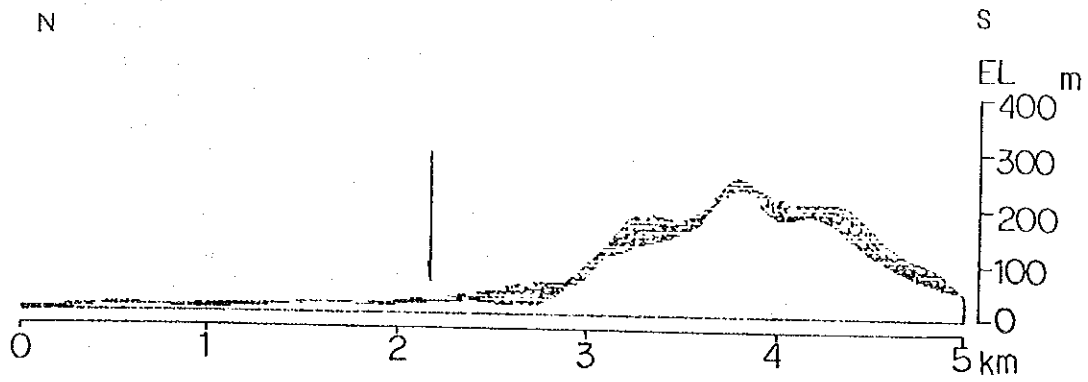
Longitudinal Section along River Stream of Khao Che Tra Dam Site
